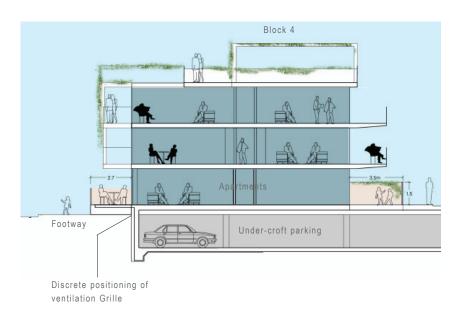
Cross section through Block 4 along Vanbrugh Hill Road
